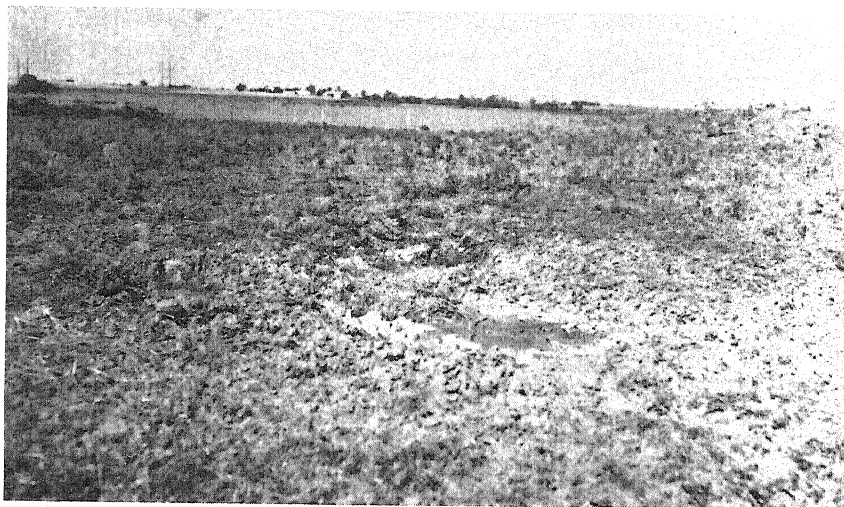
Scoured area in site 24 spillway just downstream from spillway crest. The cover on the adjoining area is thin, poor, and short.
